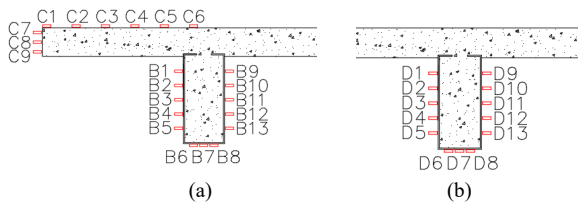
Arrangement of the strain gauges in different cross sections. (a) Cross section A-A. (b) Cross section B-B
